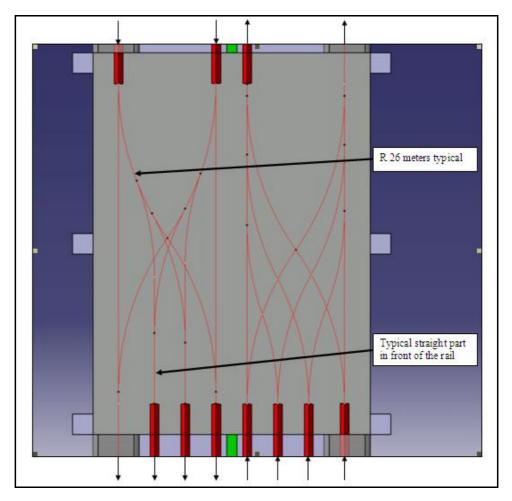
Side View Crossing Junction Ending Access Rail Dimensions
